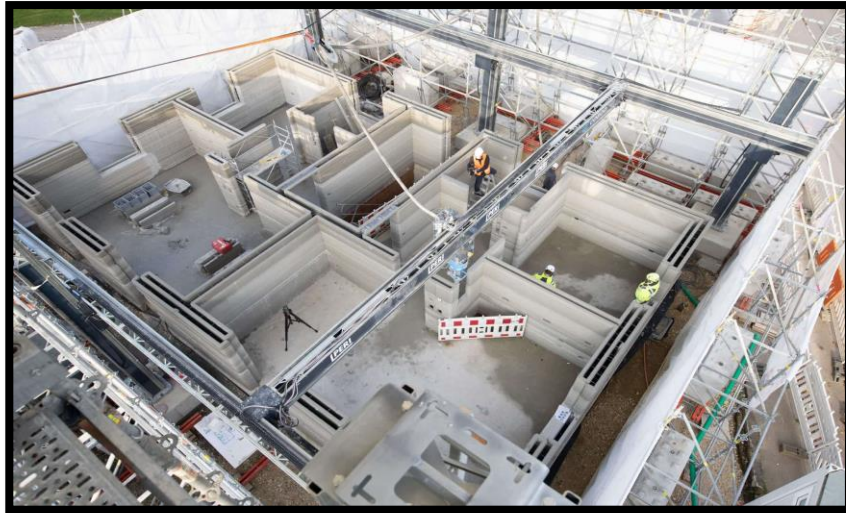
Europe's Largest 3D Printed Apartment Building (PERI 2021).
